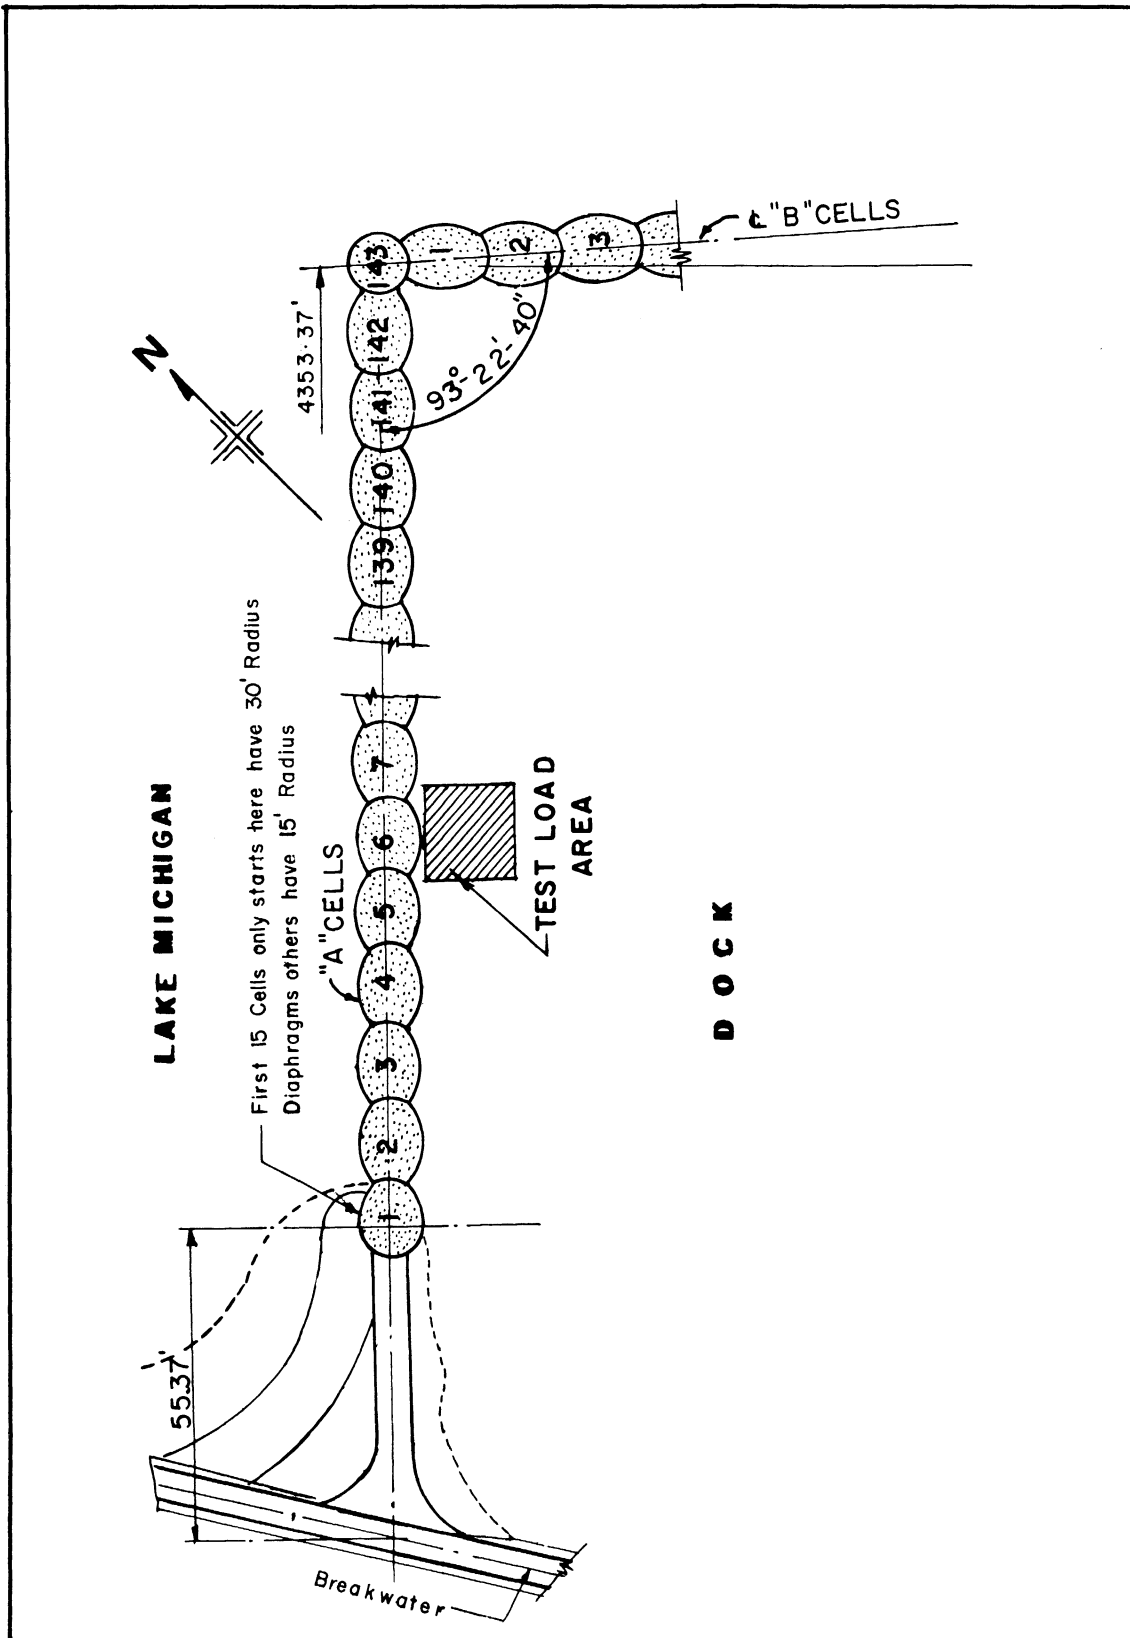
LOCATION PLAN OF TEST LOAD AREA
